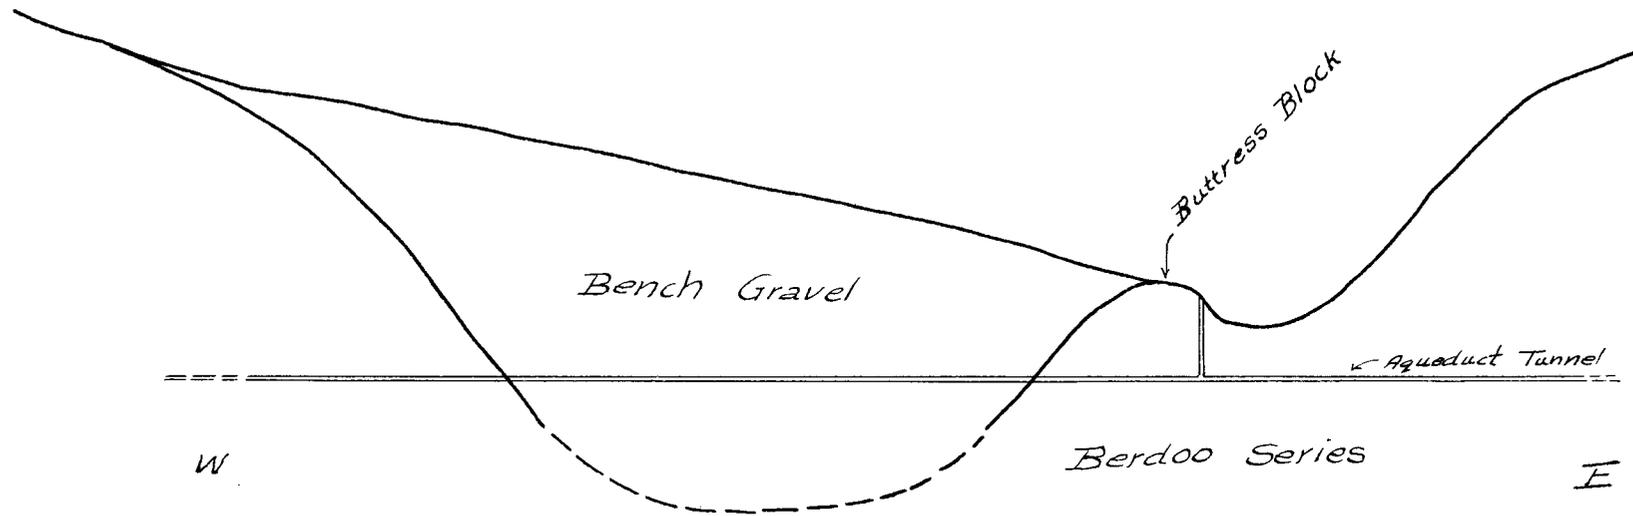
Plate III. Vertical Section along line of Tunnel, Berdoo Canyon,
